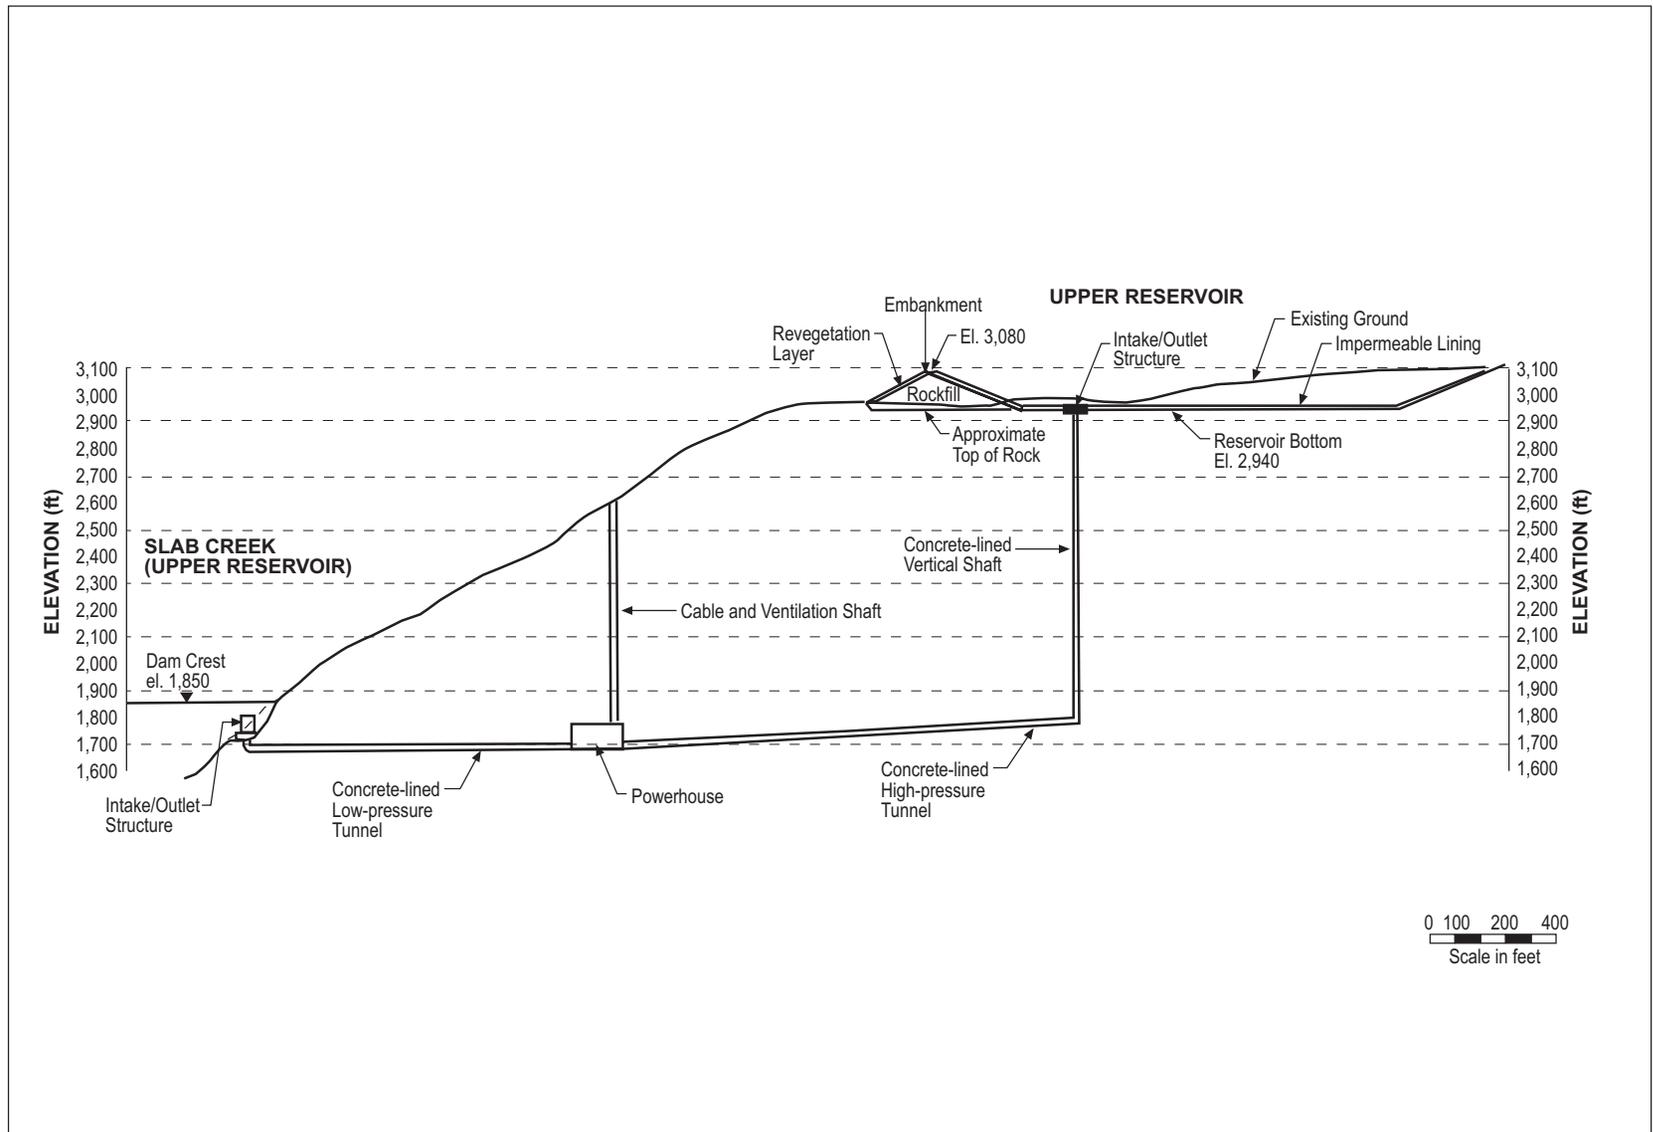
Schematic of the proposed Iowa Hill pumped-storage operation. (Source: SMUD, 2005, as modified by staff)
